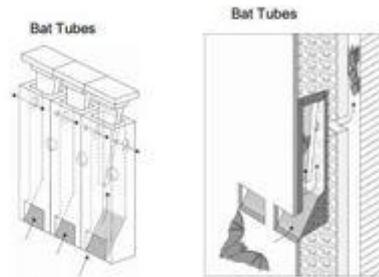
Drawing of Proposed Alternative Bat House (Not Drawn to Scale)
